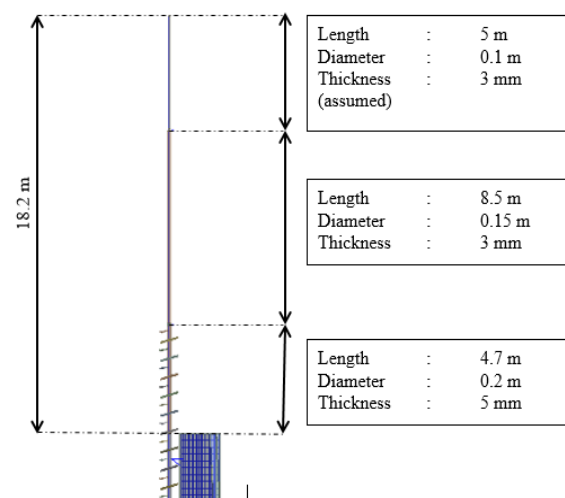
Profile of lightning arrestor extended beyond top of fin wall
